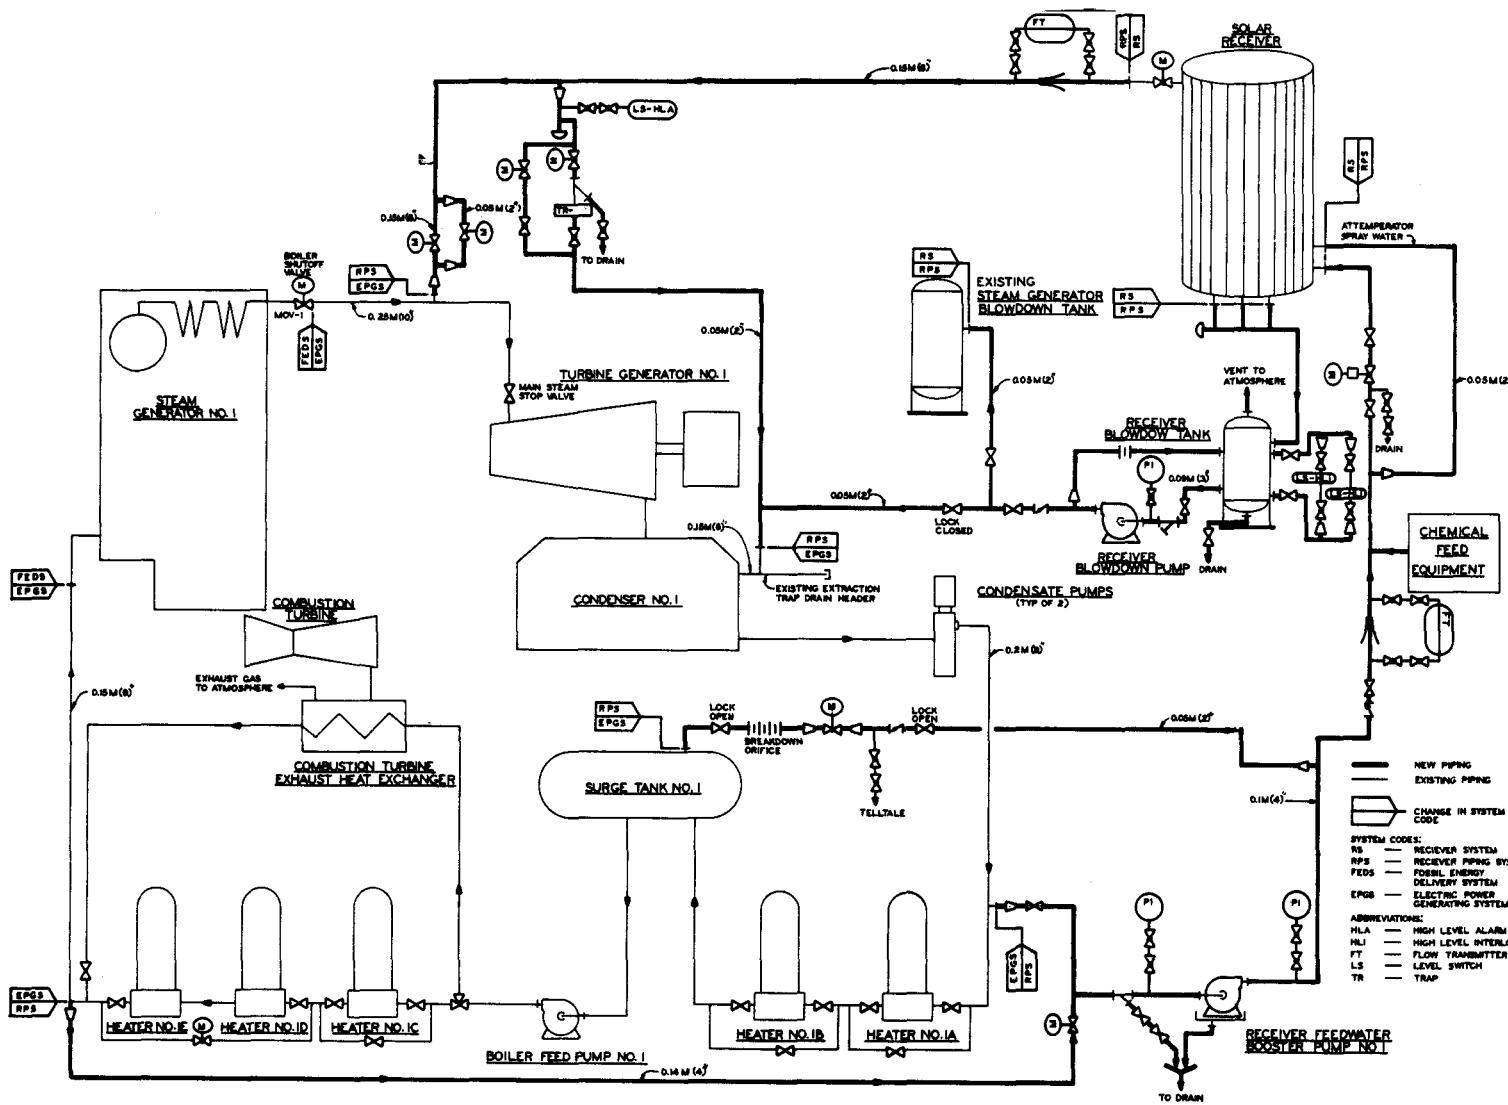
RECEIVER PIPING SYSTEM SCHEMATIC
